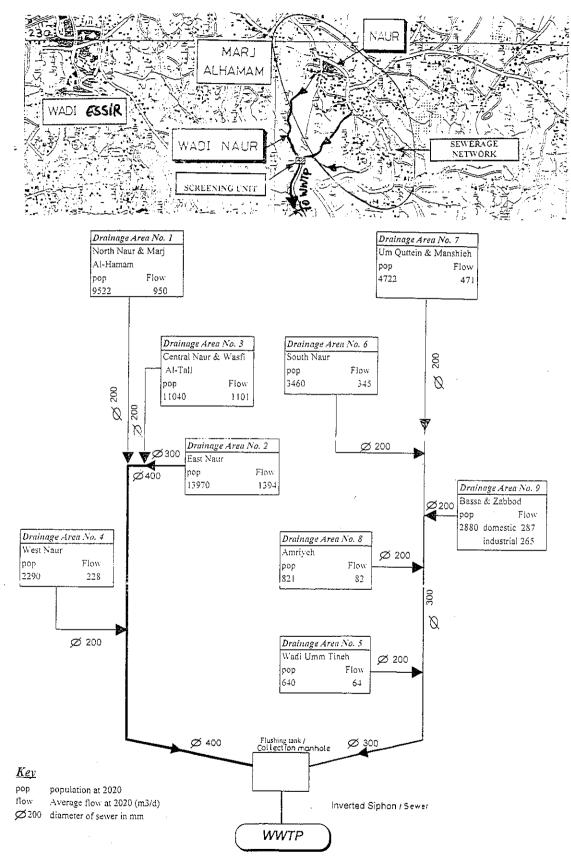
General Layout of Proposed Sewerage System - NAUR
